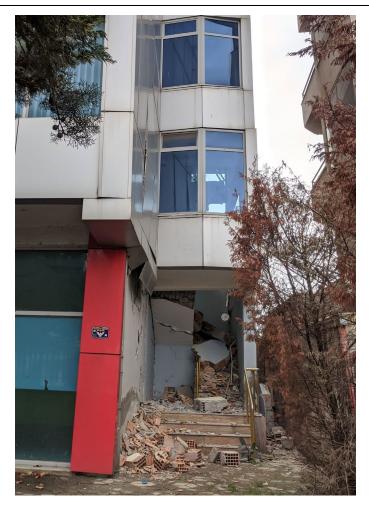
Masonry infill debris blocking stairs in Durrës (source: C. McKenney, 2019).
